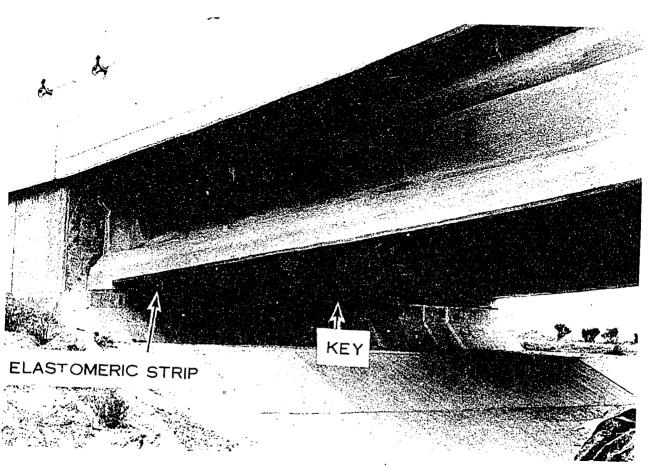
Prestressed concrete bridge on elastomeric bearing pad.
